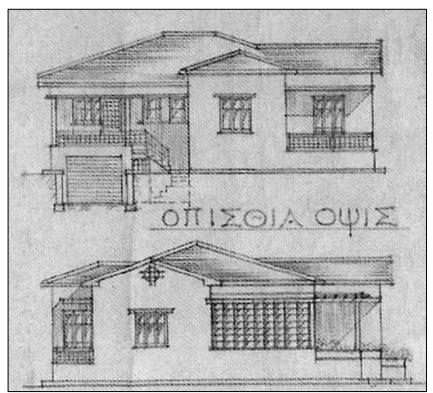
Typical house project elevations by PWD Architect Andreas Meletiou (RIBA) in 1951 (Georghiou, Late Colonial House at Pavlos Nirvanas Street, Nicosia, 2013).
